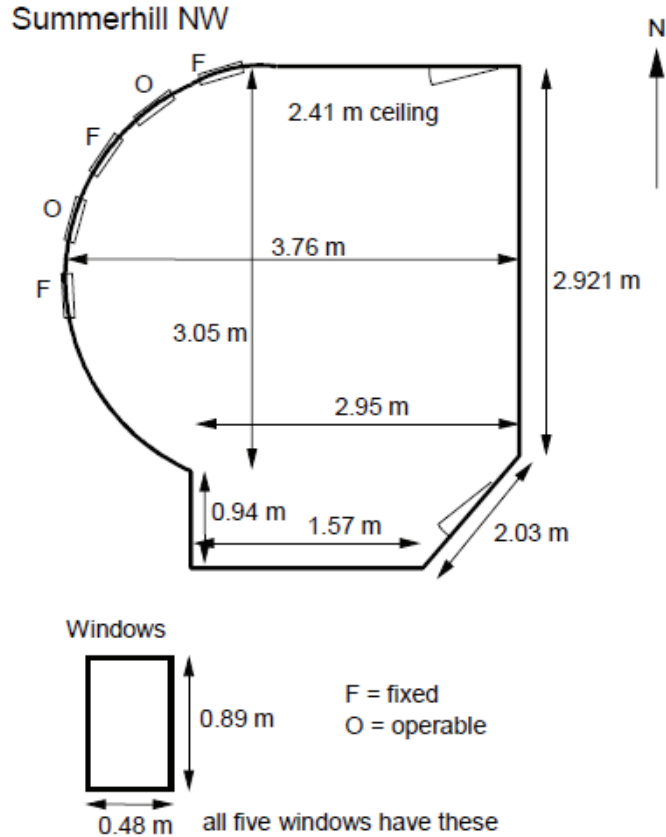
Plan of Summerhill Northwest (NW) Bedroom. North and West walls exposed to aircraft noise. Reproduced from [14].
